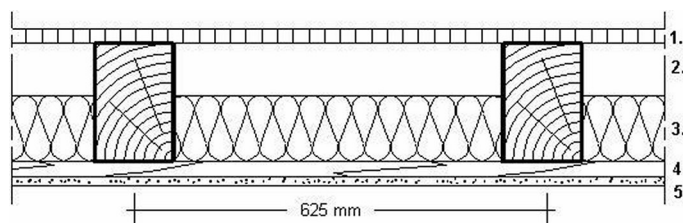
Construction of the light-weight wooden floor; layer structure (from top to below): 1 - 22 mm wooden chipboard, screwed to the joists; 2 - wooden joists; 3 - 100 mm mineral wool; 4 - 24 mm wooden ceiling battens, crewed to joists; 5 - 12,5 mm gypsum board, screwed.
